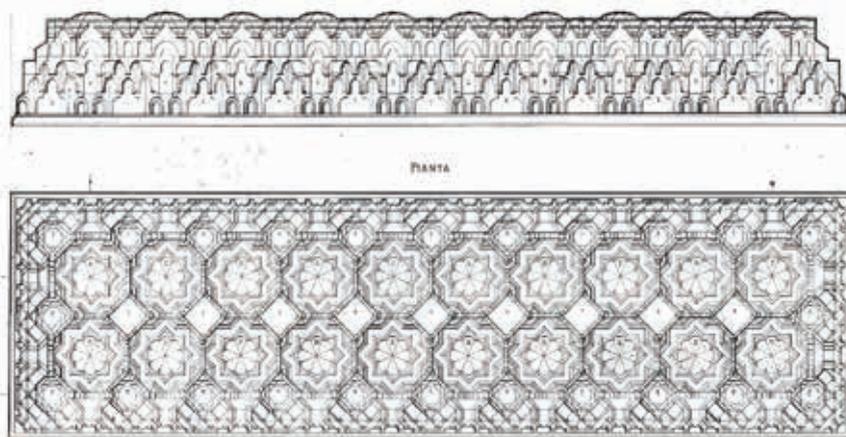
19th century survey showing longitudinal section and intrados plan of the ceiling.
